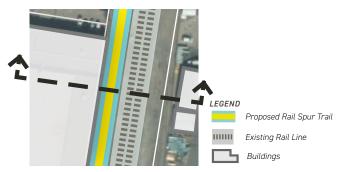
TRAIL SECTION LOOKING WEST FROM THIRD ST
